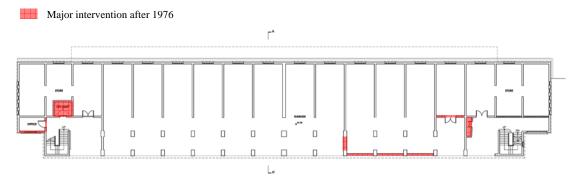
Ground floor plan of Block A of the former Police Married Quarters.
